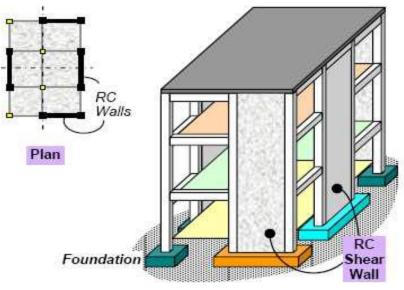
Typical plan & elevation view of shear wall building (Source: IITK-BMTPC Earthquake Tip 23)
